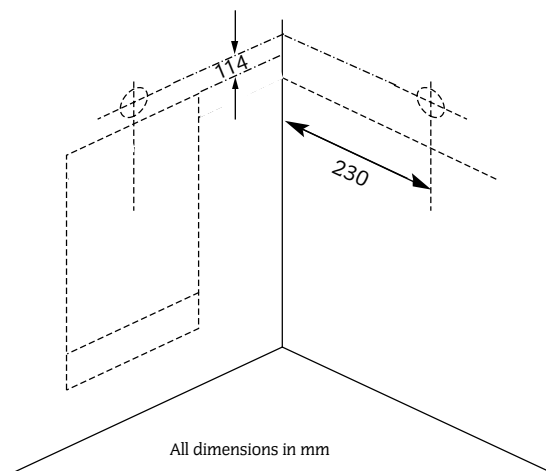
Appliance casing dimensions and required clearances (side view).
